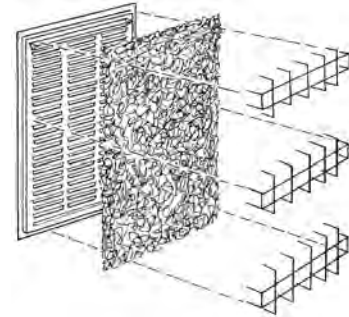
STANDARD EXCELSIOR COOLER PAD
